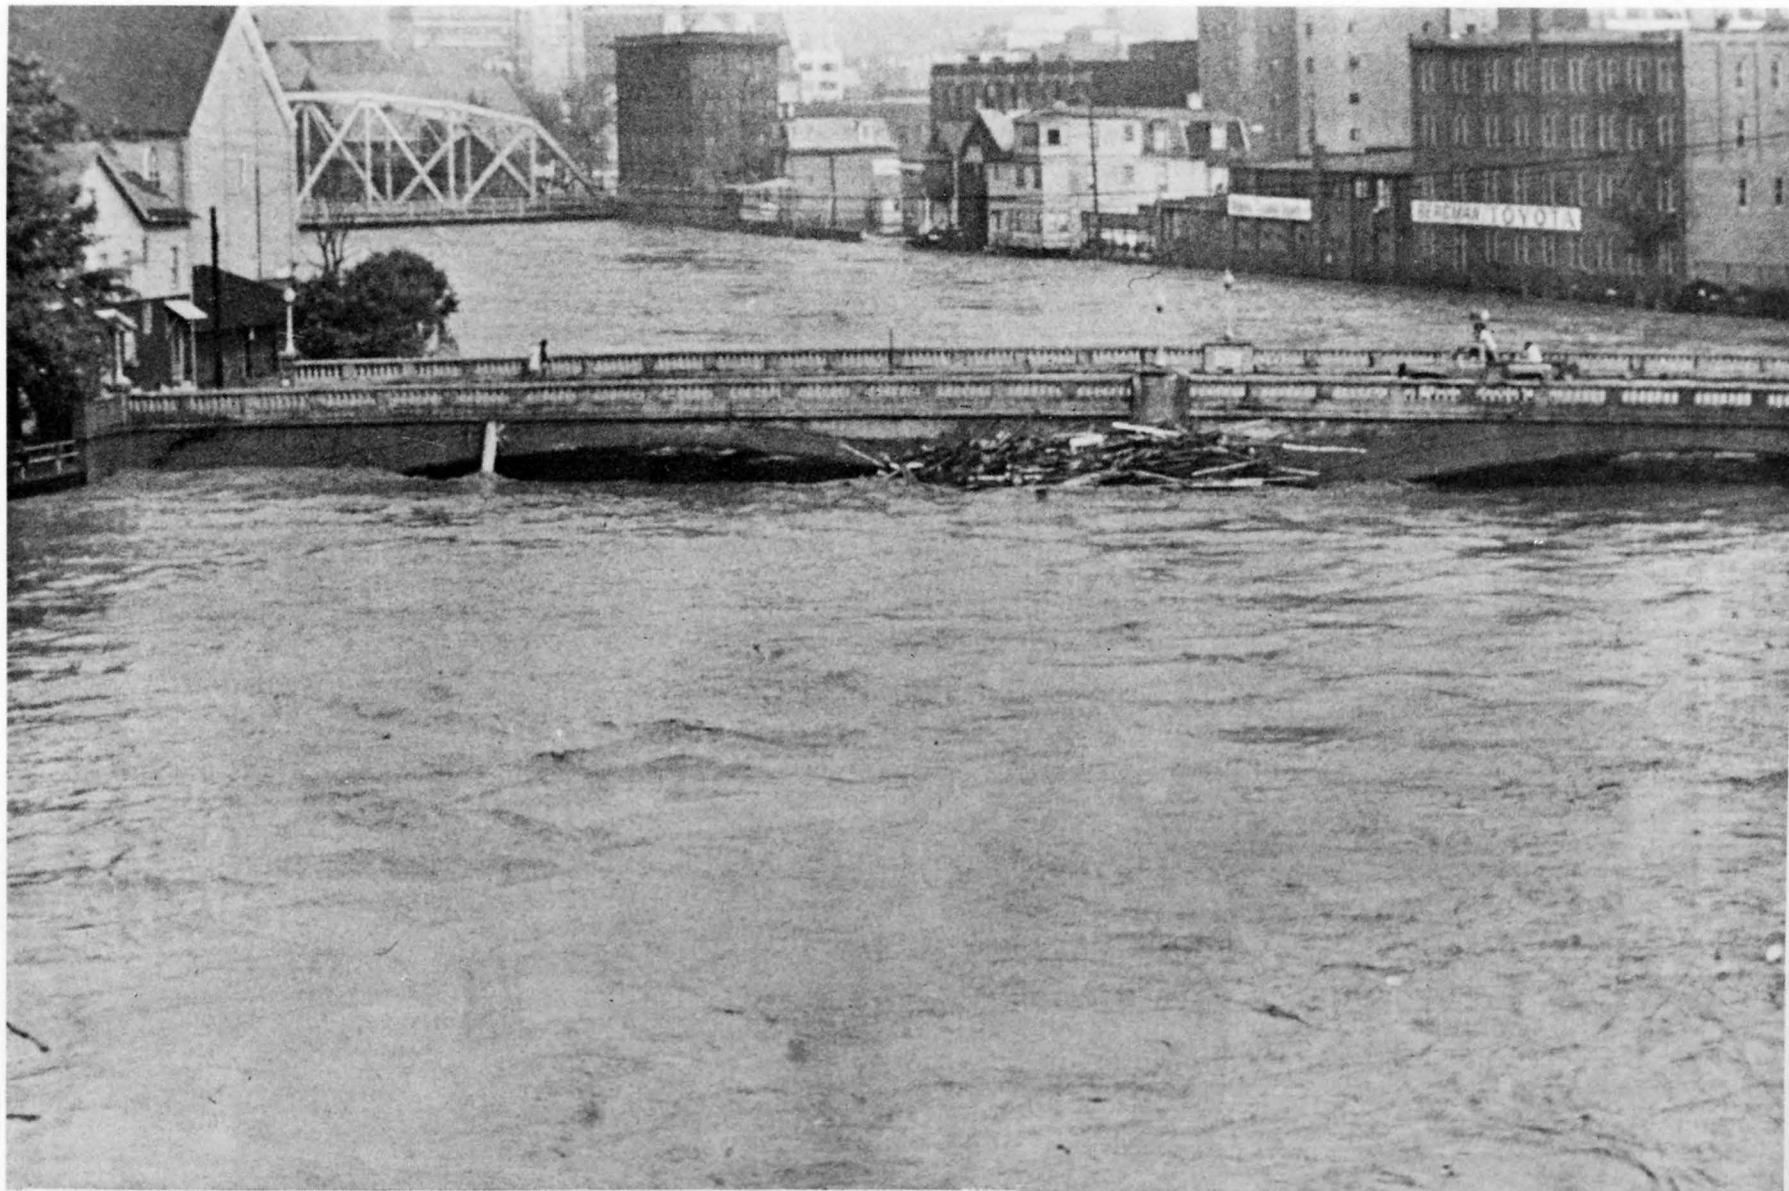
View of Haynes Street bridge over Stony Creek looking downstream toward Johnstown's business district (Johnstown Tribune-Democrat photo).
